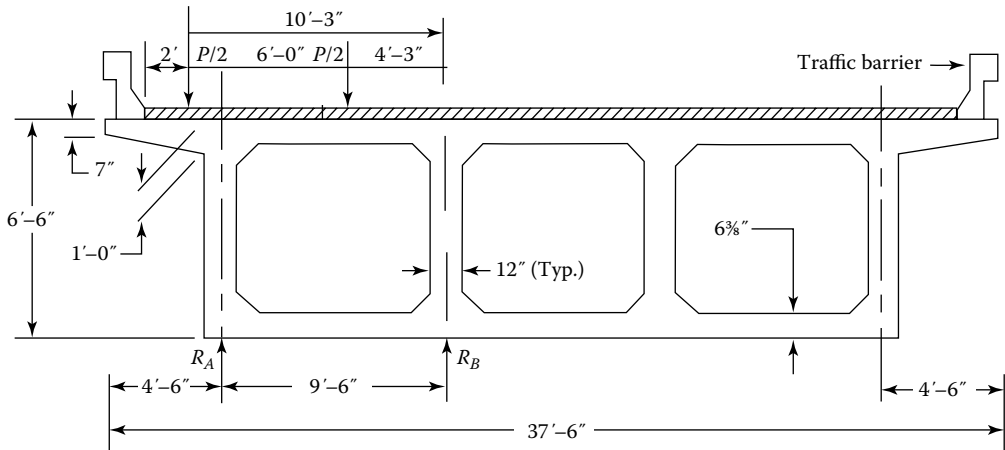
Lever rule for cast-in-place multicell box girder bridge of Example 4.7.
